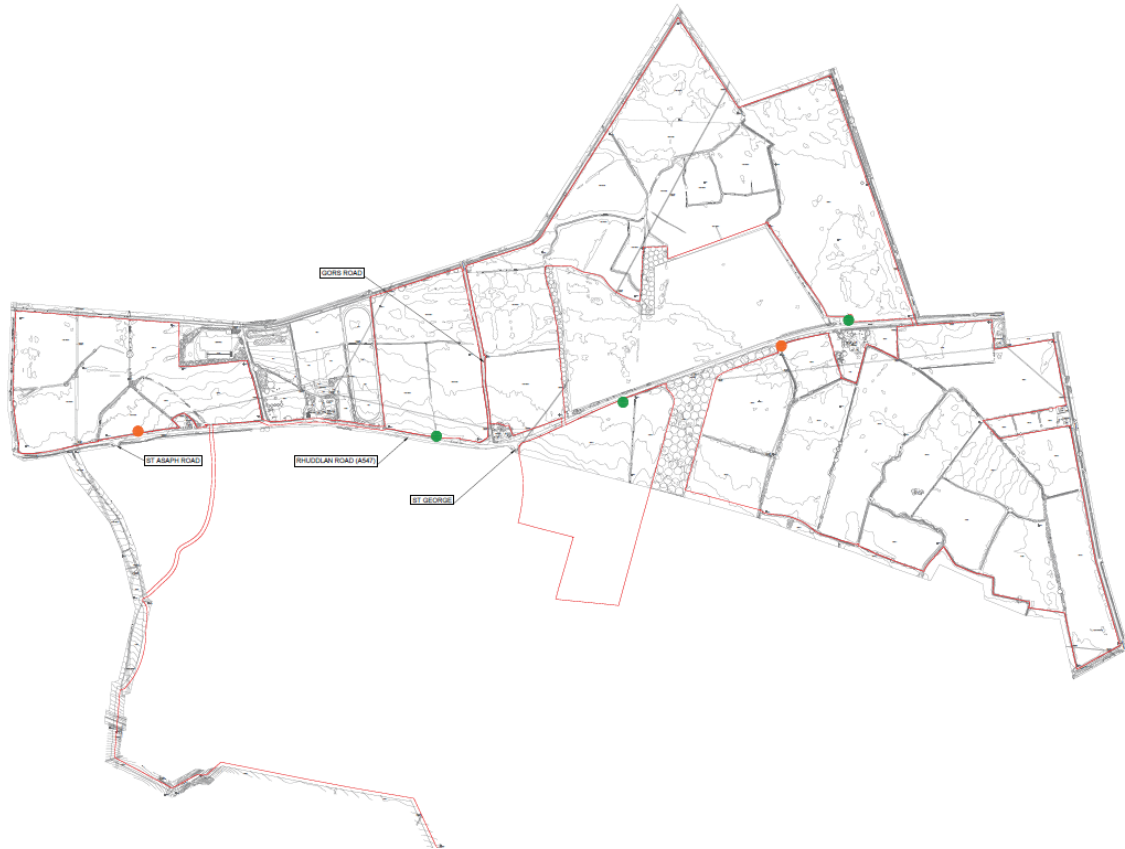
Construction Traffic Access Plan (Proposed Development)
